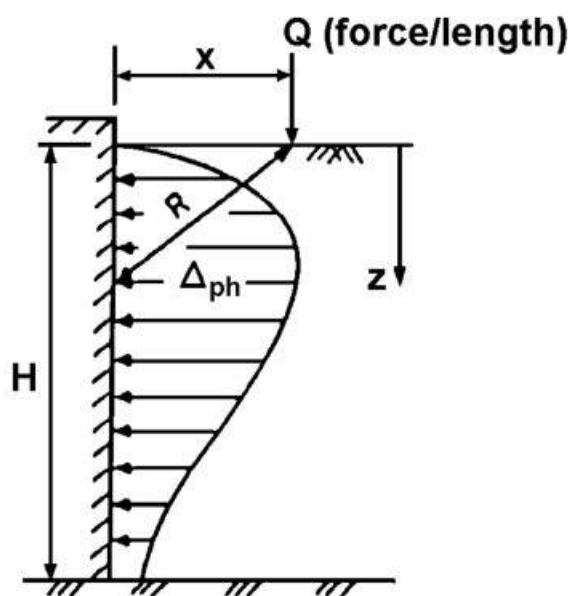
Horizontal Pressure on a Wall Caused by an Infinitely Long Line Load Parallel to the Wall
